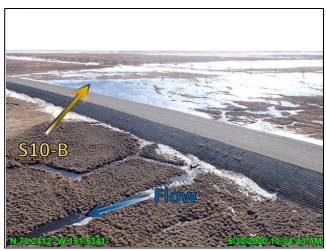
Flow through culvert MT7-63, looking southeast; May 30, 2020
